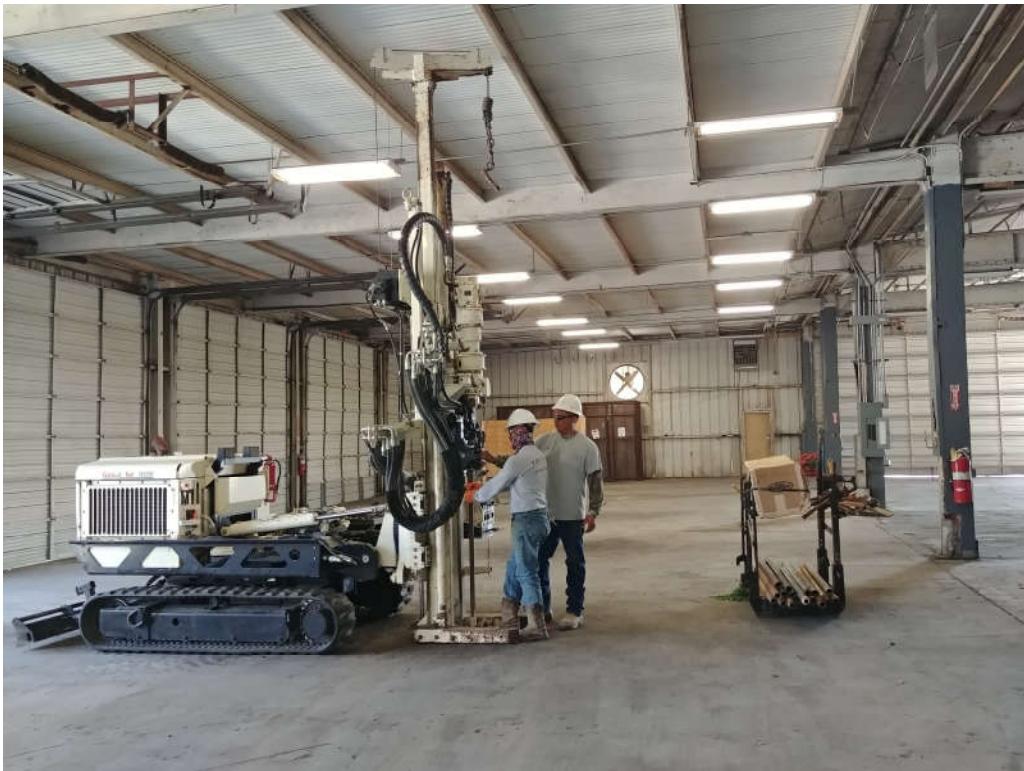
Location of boring B2; photograph facing northwest.
